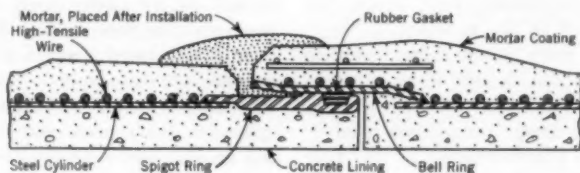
Lined-Cylinder Prestressed-Concrete Pipe and Joint
